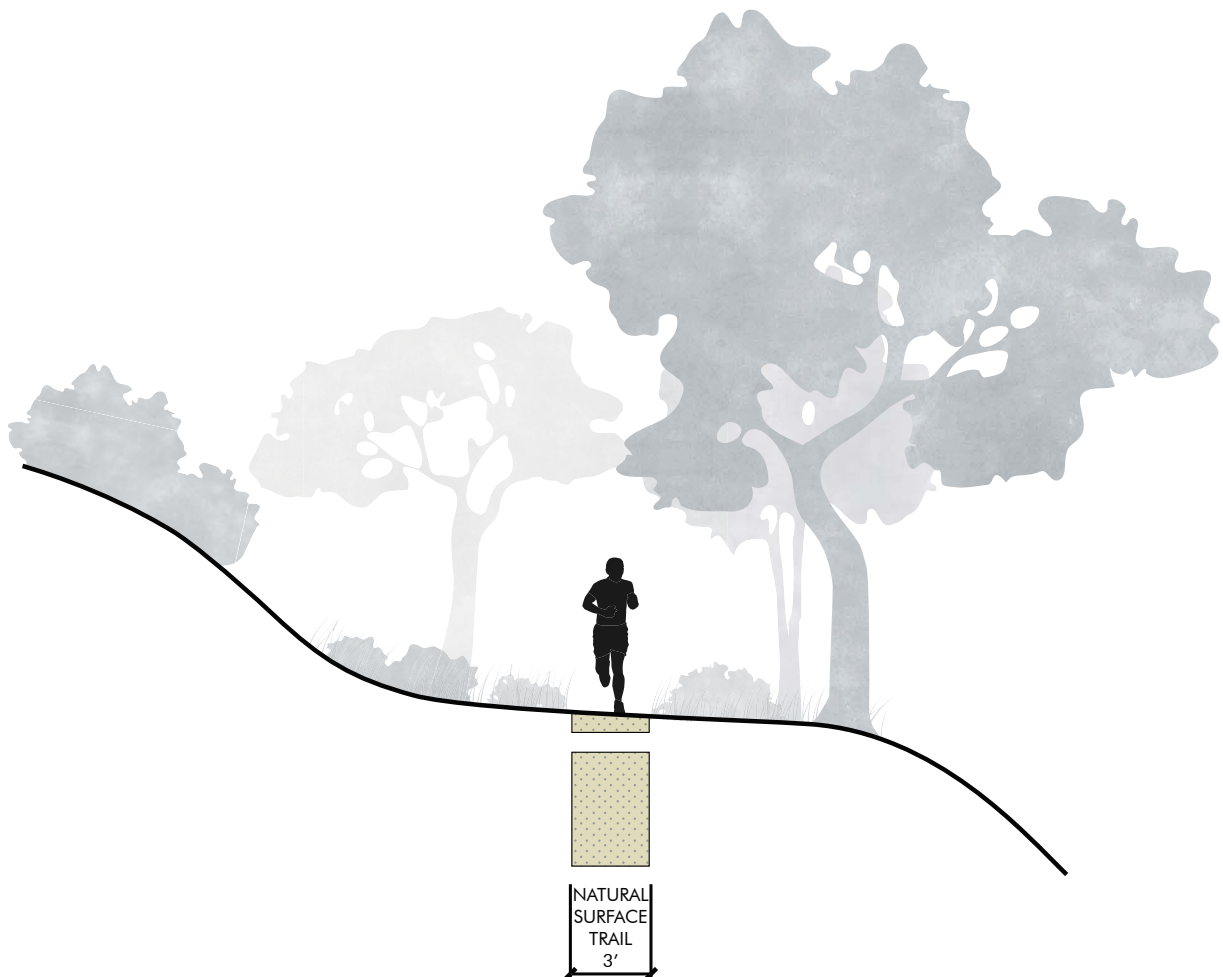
TYPICAL SECTION: OPEN SPACE (FRONT COUNTRY)
